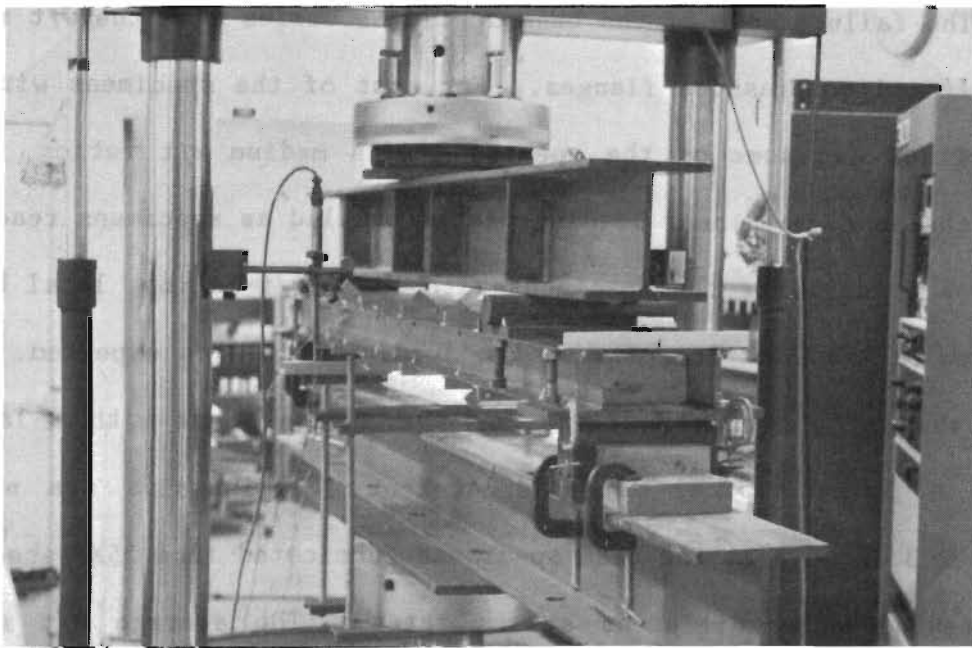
Photograph of Test Setup for Channel Beam Specimens
